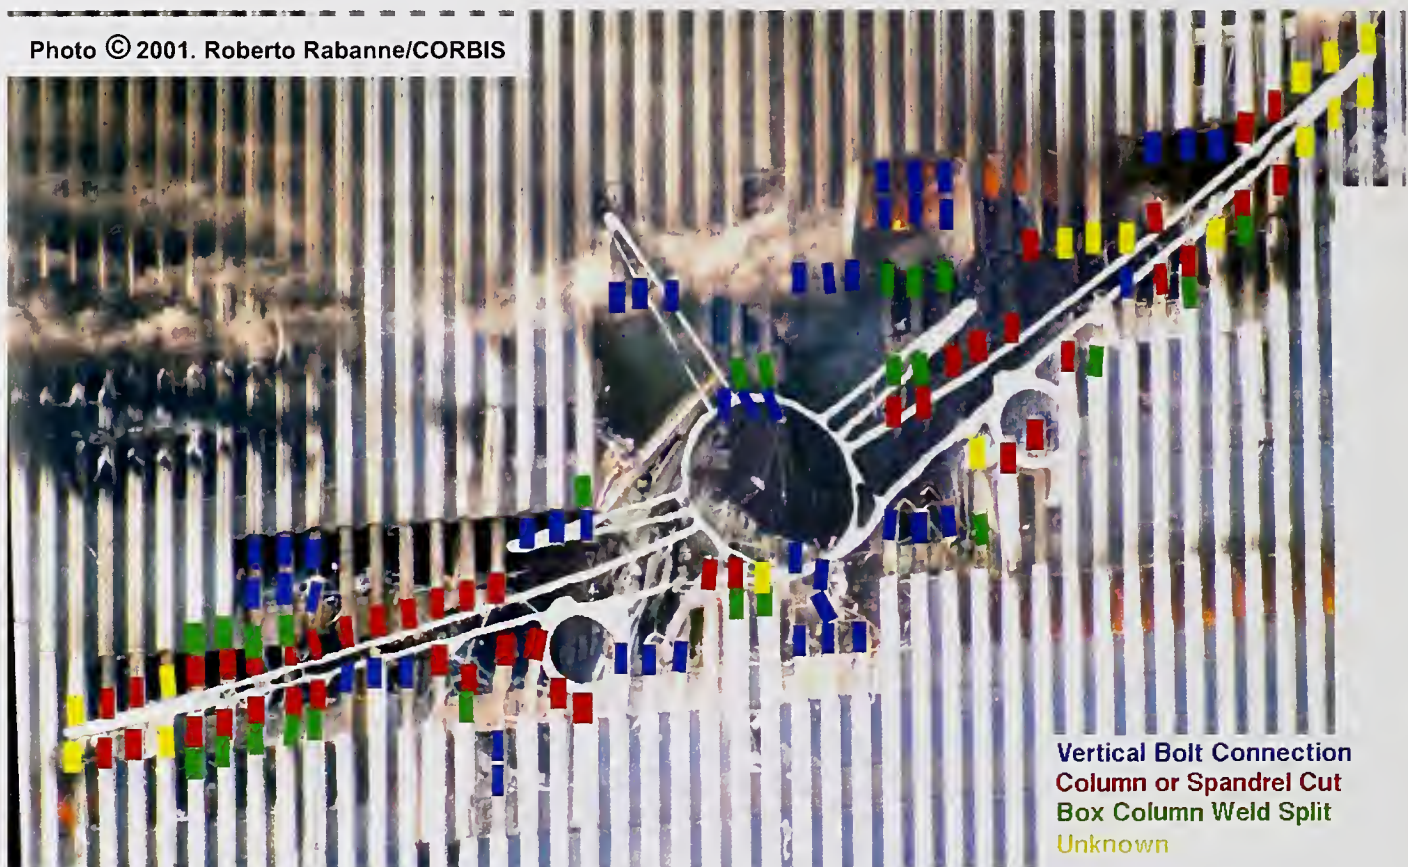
Enhanced precollapse image of the north face of WTC 1 with superimposed outline of the Boeing 767. Likely failure modes of damaged columns are indicated.
